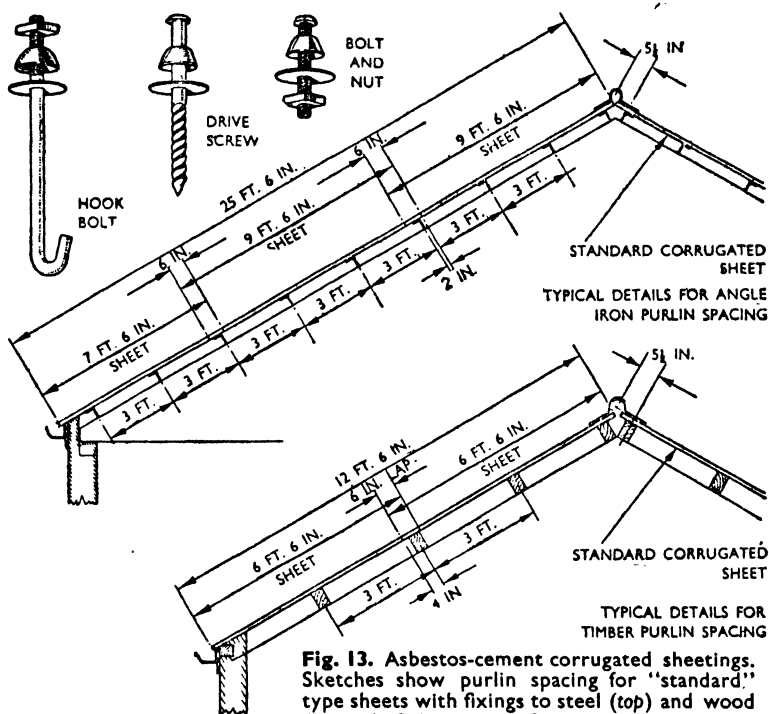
Asbestos-cement corrugated sheetings. Sketches show purlin spacing for "standard" type sheets with fixings to steel (top) and wood (bottom). Other types of asbestos sheetings can be used in cases where a wider spacing of the purlins is necessary or desired.
